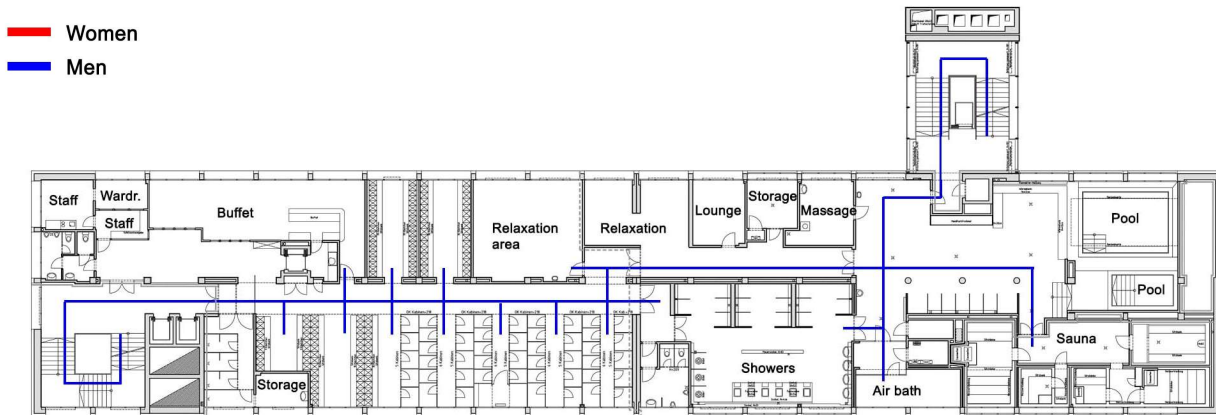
2<sup>nd</sup> floor plan Floridsdorfer swimming hall 1:500 (source: MA 44, 2016/17)
